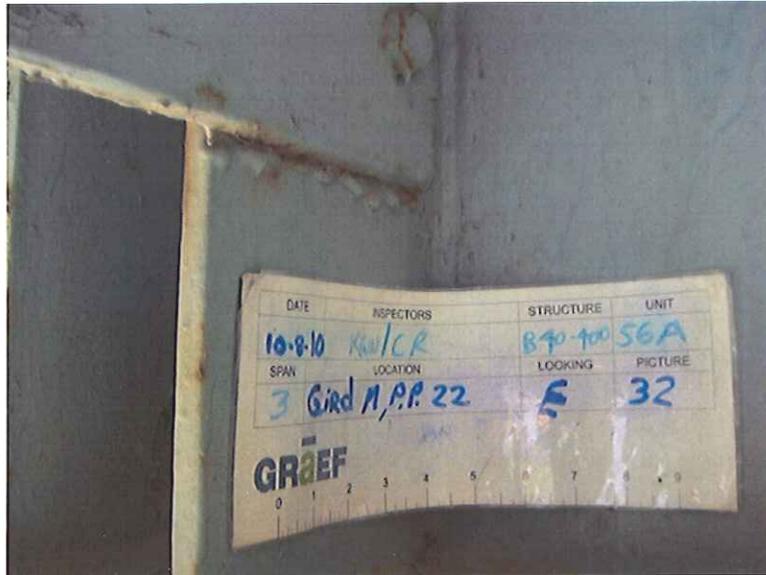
Incomplete fusion at cross-frame bottom chord to connection plate
